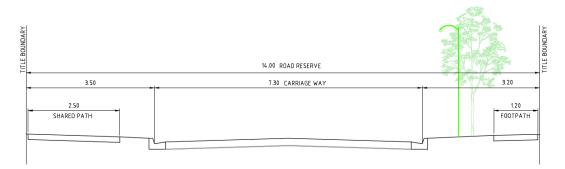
Typical Cross Section for 14 m Residential Access Street
